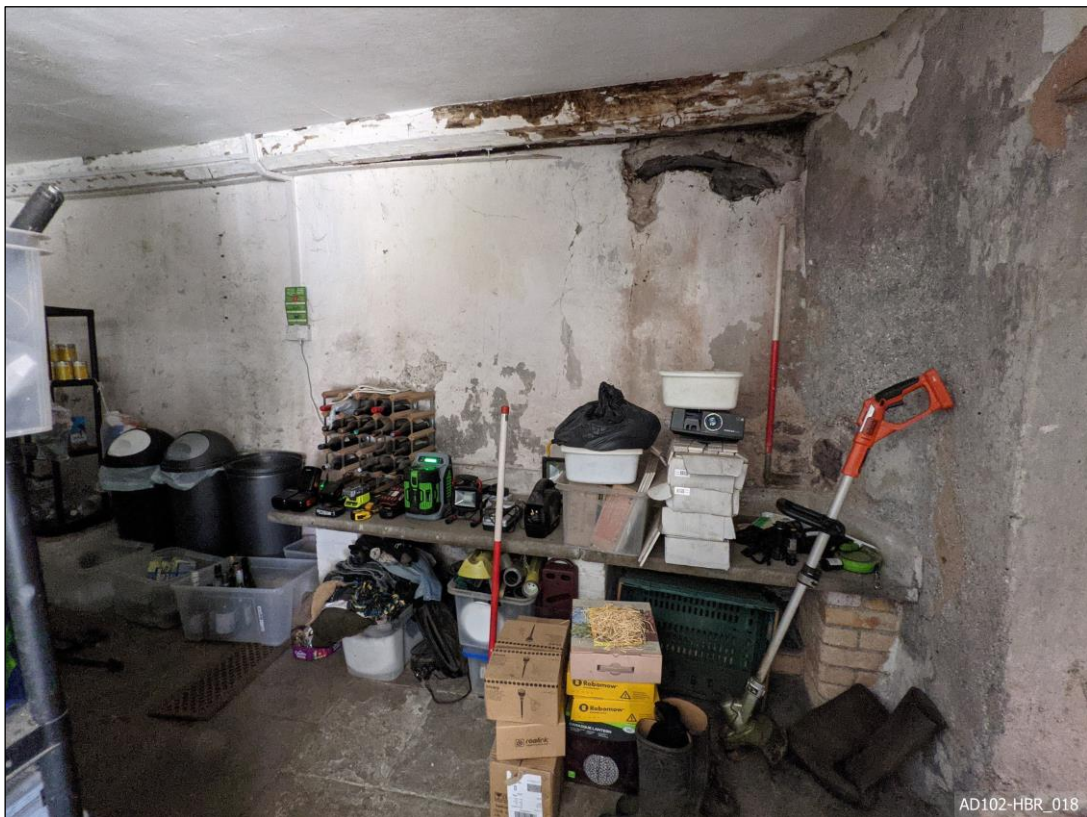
Doorway B – View south-east, showing south-west elevation.
